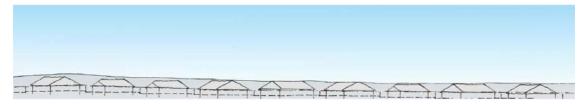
Indicative Earth Mound Elevation (Transparent)
